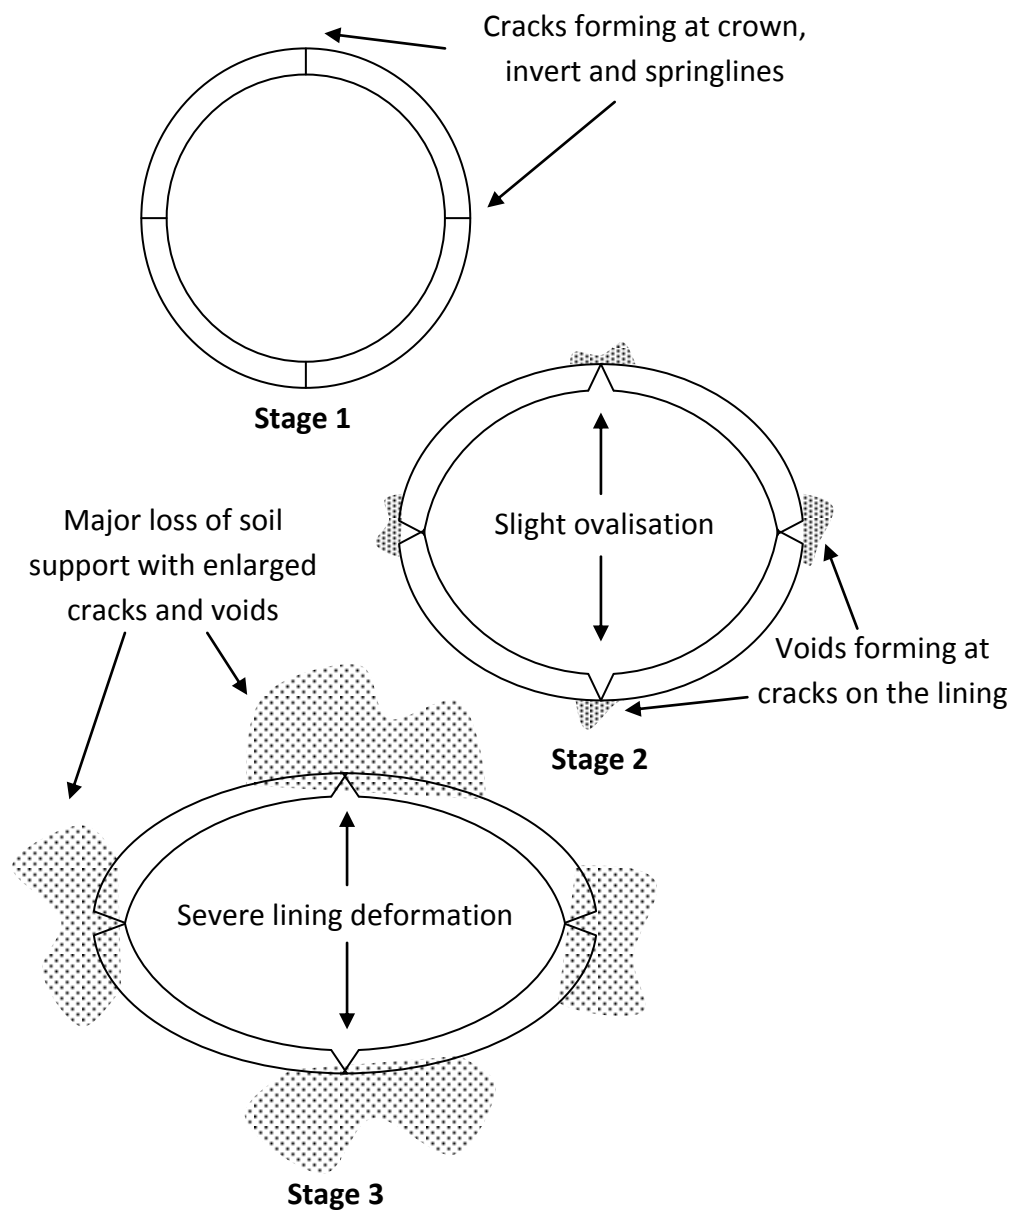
The stages of sewer pipe failure (Adapted from Davies et al. 2003)
